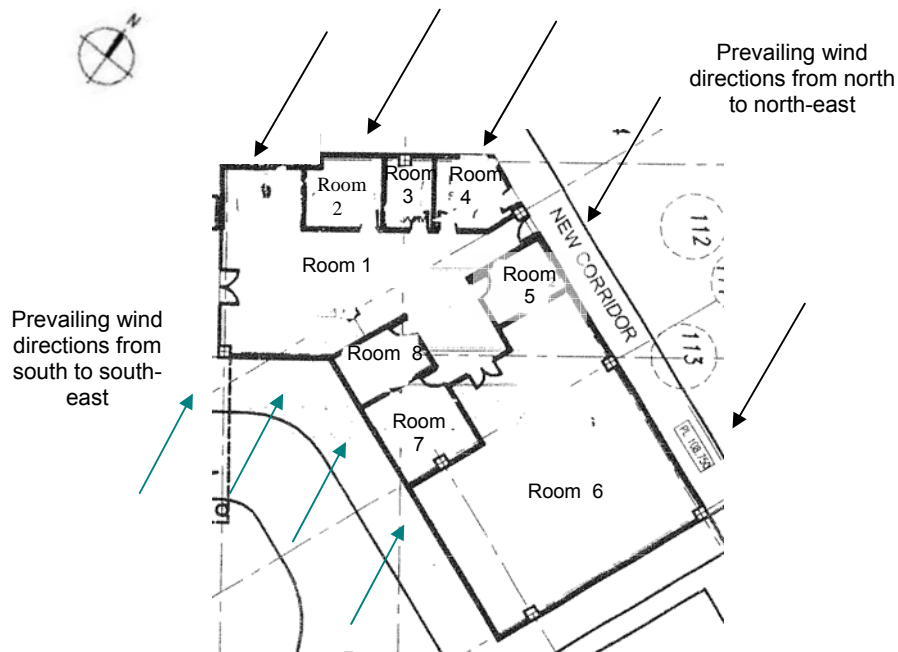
Building layout shows not all rooms with window openings facing the north and south directions. Room 2 to Room 5 would only have prevailing wind in one direction. Only Room 1 and 6 can be considered meeting the requirement 1-4(a).
